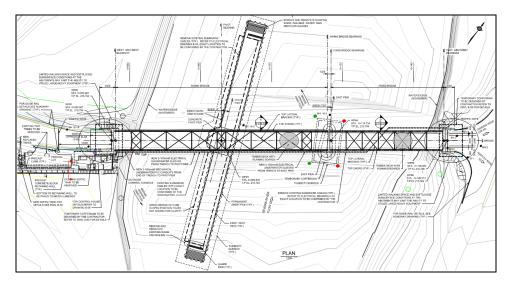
New Hamlet Swing and Fixed Bridges Plan
